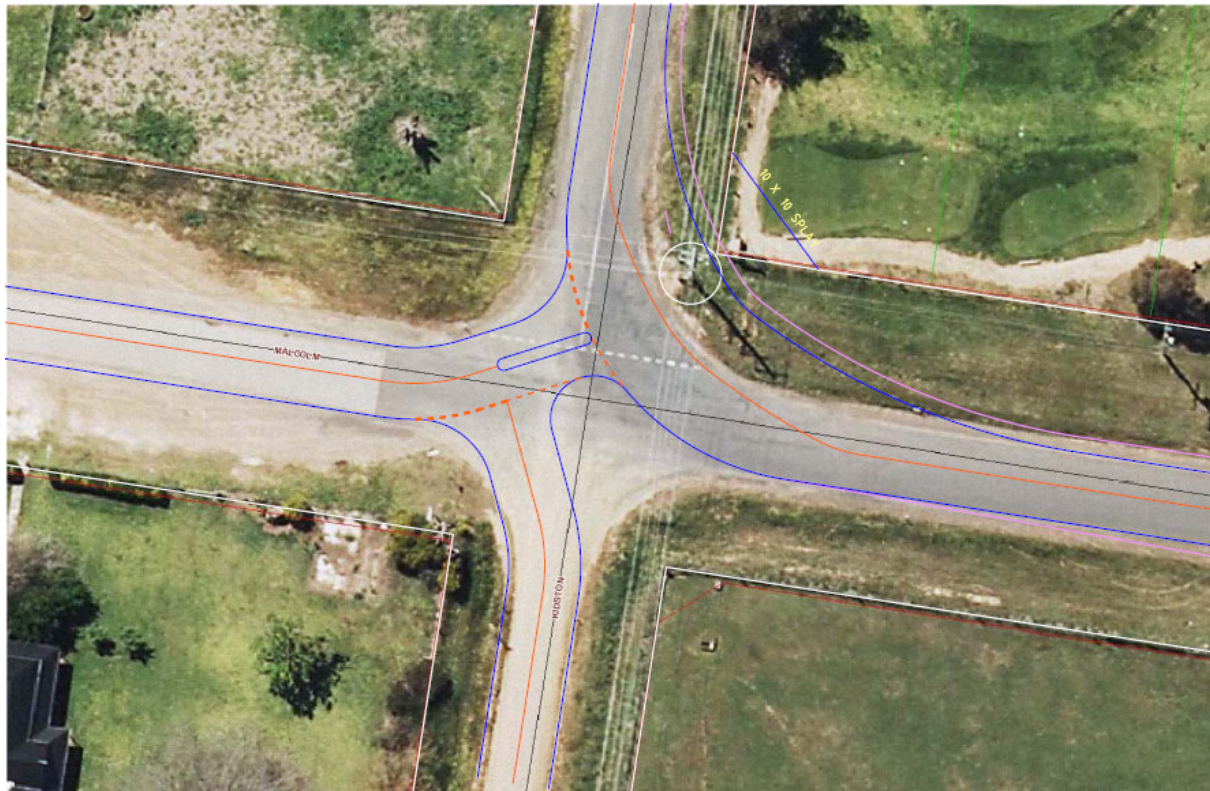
Proposed works at Malcolm Street/Kidston Parade intersection.
